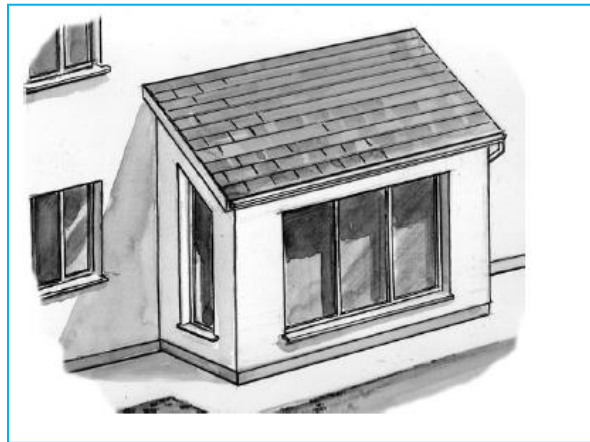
External wall of a house showing a 1.5 m projected triple glazed window.
